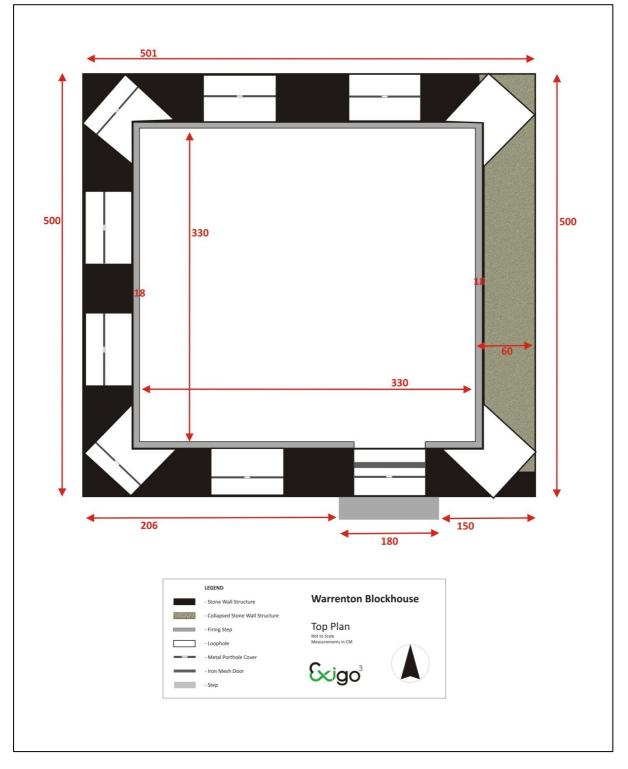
Top Plan of the Warrenton blockhouse structure.
